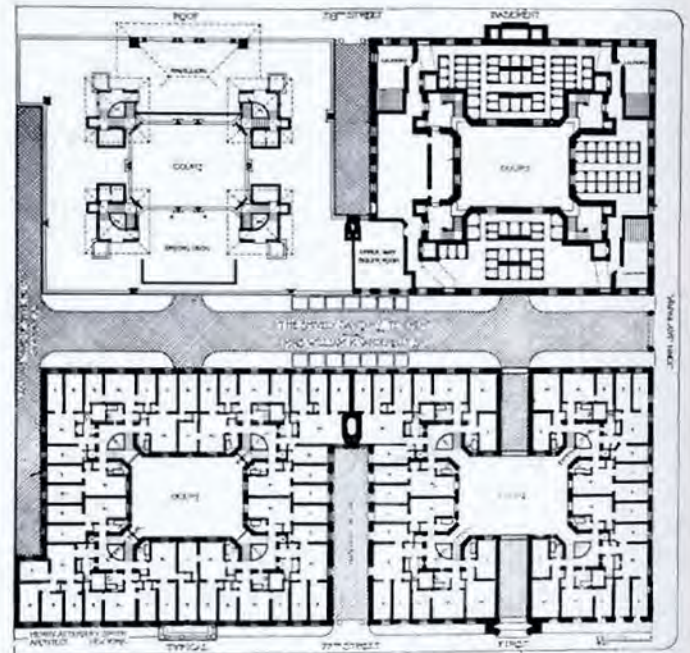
East River Houses. Henry Atterbury Smith. 1908-1909. Plan of typical floor, basement, and roof.
